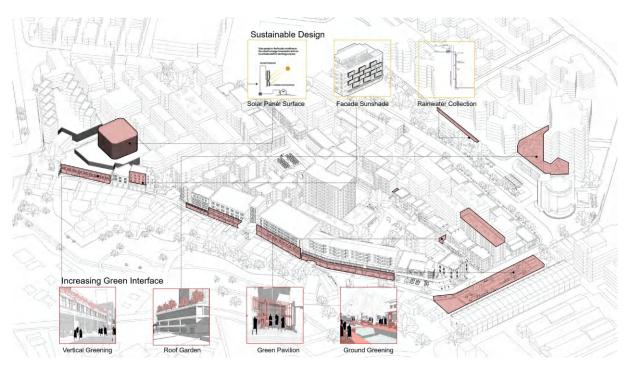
Street Walls Carrying Green interface Design (Source: Drawn by the Author)
